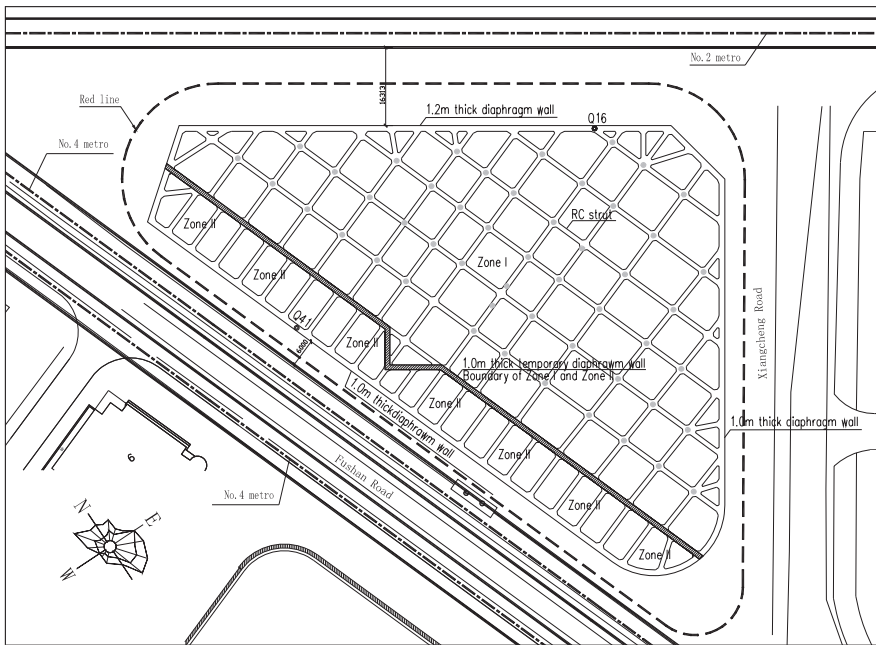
Plane view of the construction site of the Shanghai Shengda Center.
